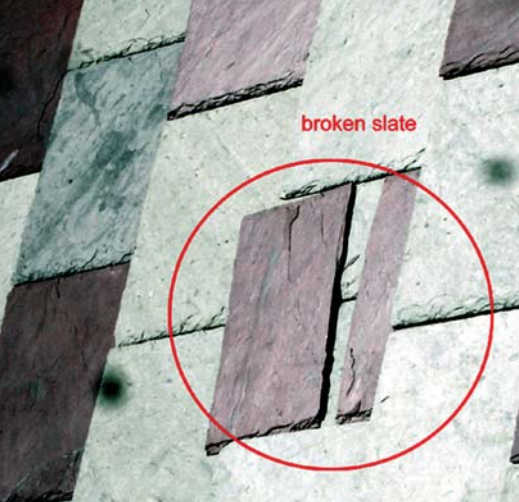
(above): Slate roofs that are walked on during installation will shed slates after the roof has been installed, perhaps for years.
